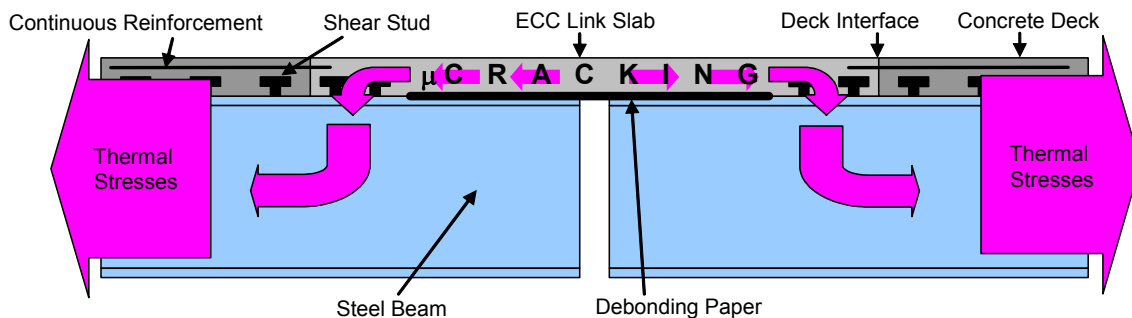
ECC design concept for link slab made from strain hardening cementitious composites.
